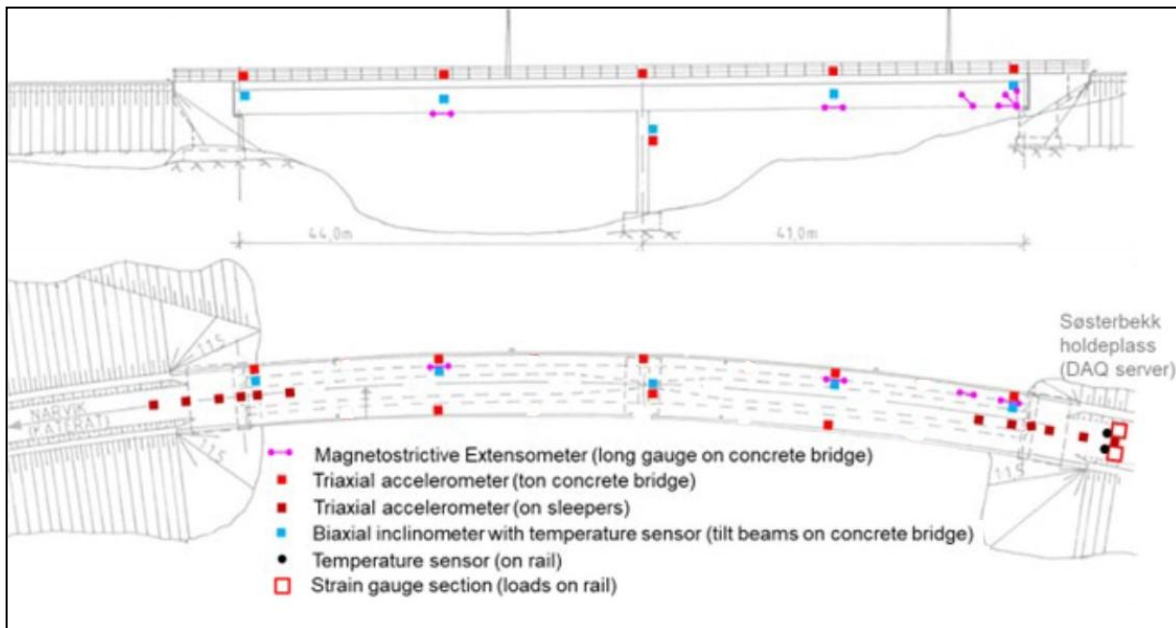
Instrumentation plan of sensor systems for Sørsterbekk bridge 2, showing type and placement of sensors.
